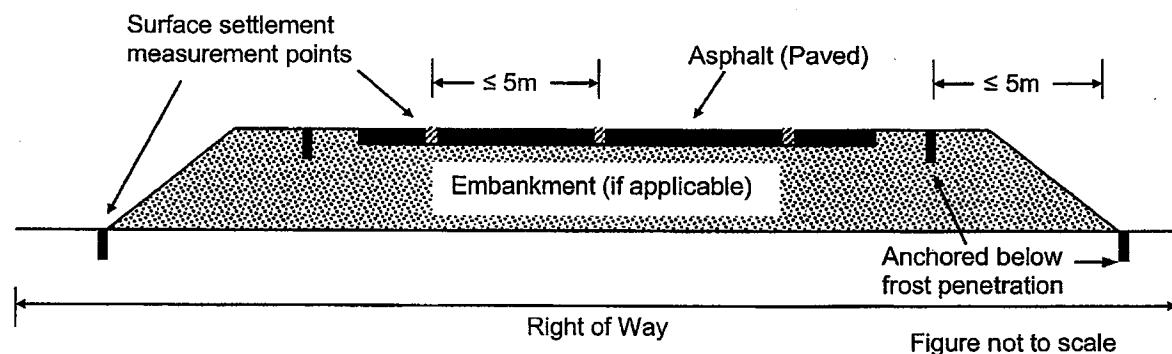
Typical configuration of surface settlement monitoring points along the tunnel alignment.
